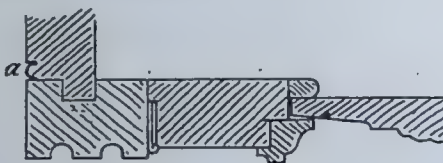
SECTION OF PILASTER AND CUPBOARD DOOR.
